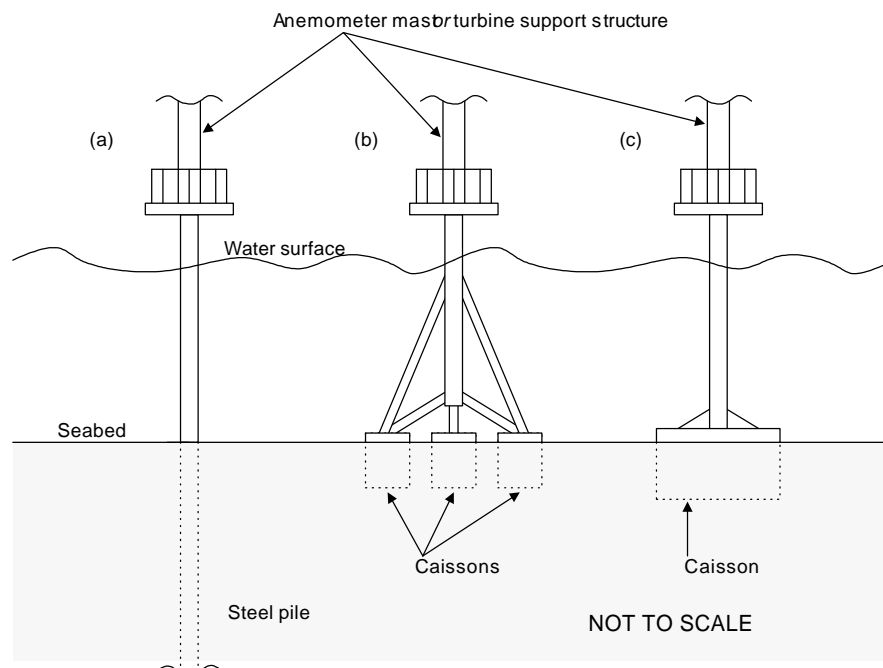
Potential foundation and structural options for offshore wind energy facilities, (a) typical pile installation, (b) tripod structure on caissons, and (c) monopod caisson structure.
